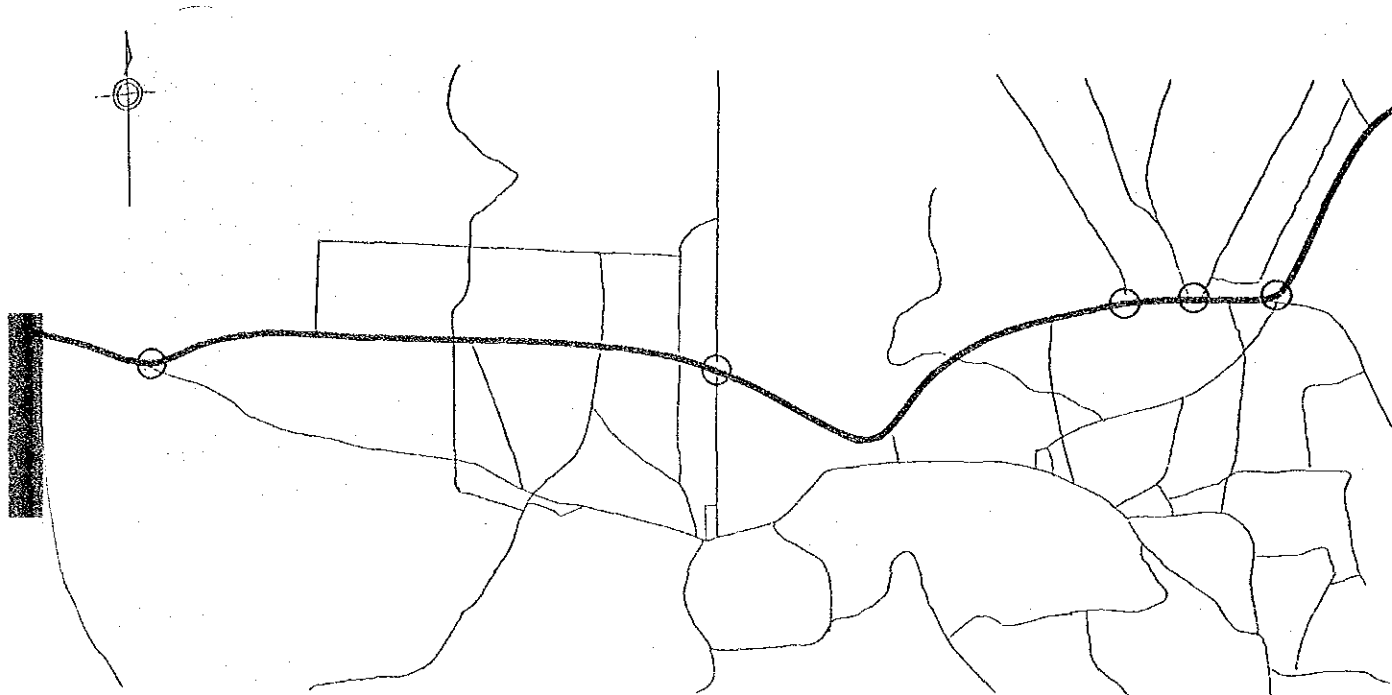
Locations of Intersection Improvement Plan, Taiz
